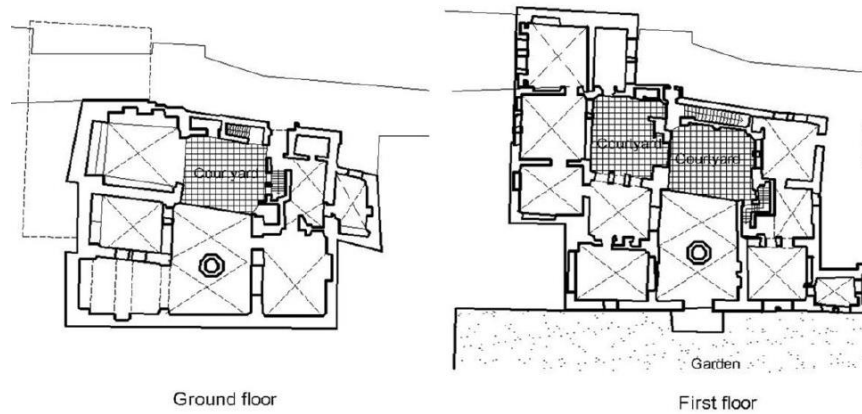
The ground and first floor plans for courtyard house (Itma, in press)
